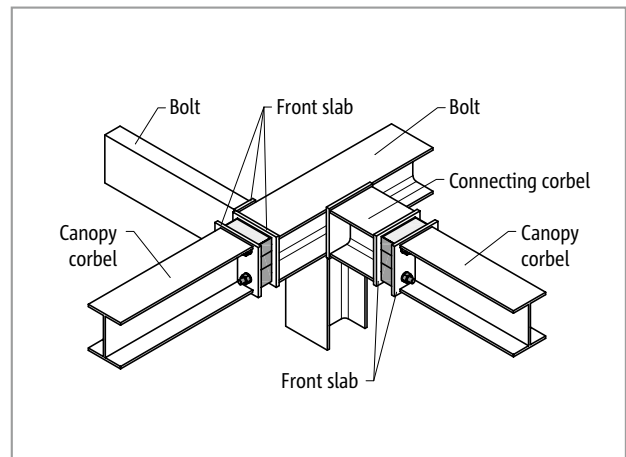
Schöck Isokorb® T type S for outer corner detail
